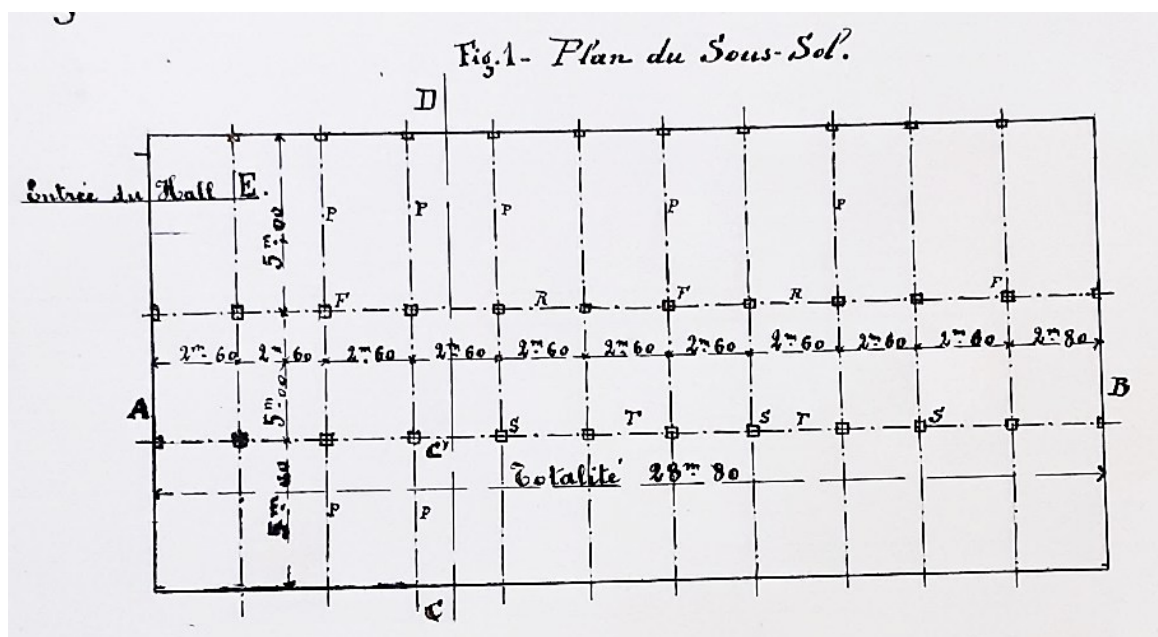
Expanded basement plan for Bossut-Masurel textile warehouse, Roubaix (unknown architect, 1892), showing the grid pattern for the béton armé system columns and beams.
